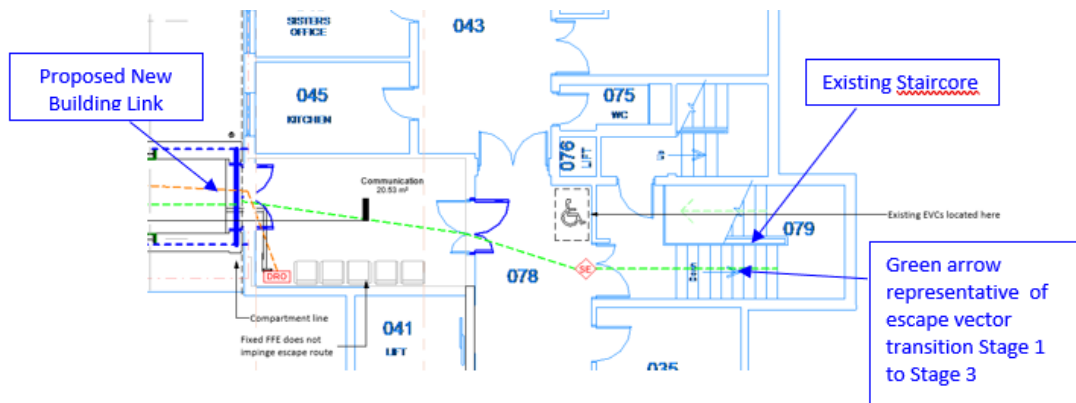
Existing Staircore & lobby interface with new building. Existing stair is proposed to be utilised as stage 3 evac from the new building
